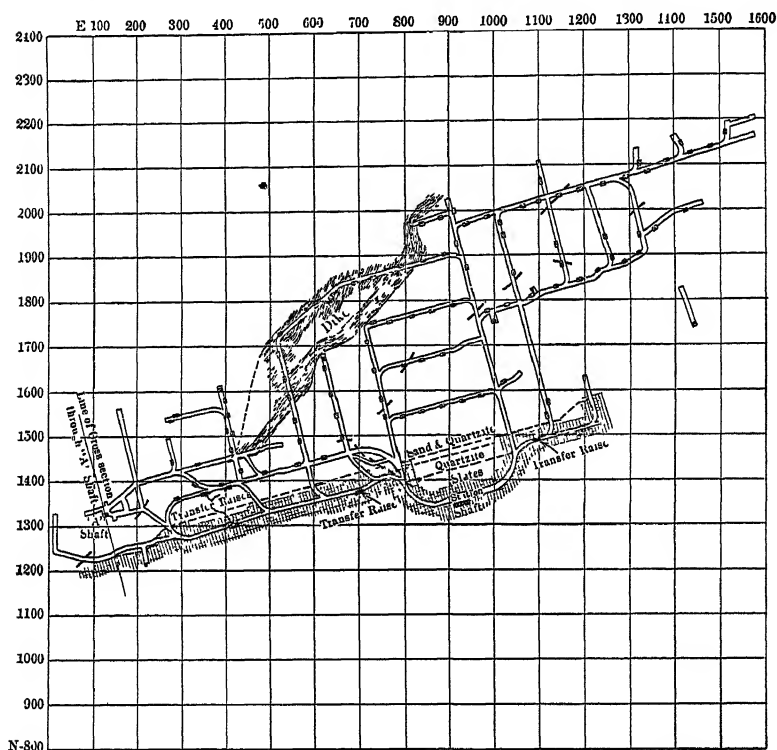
PLAN OF THE 17TH LEVEL, D SHAFT.
